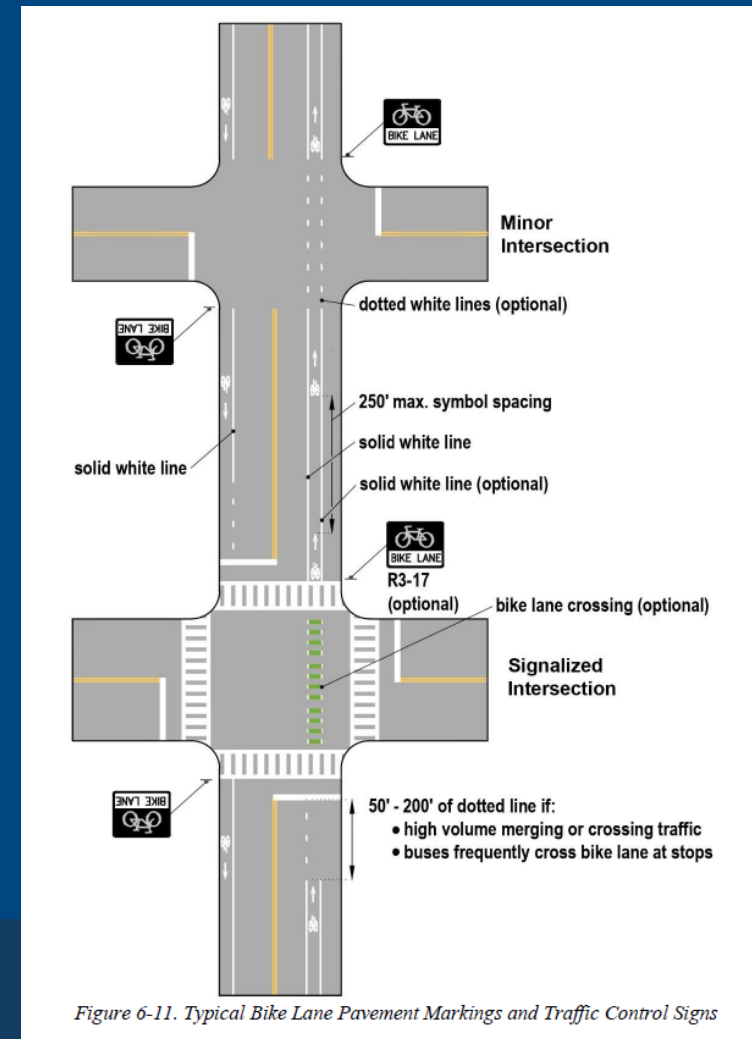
Typical Bike Lane Pavement Markings and Traffic Control Signs
